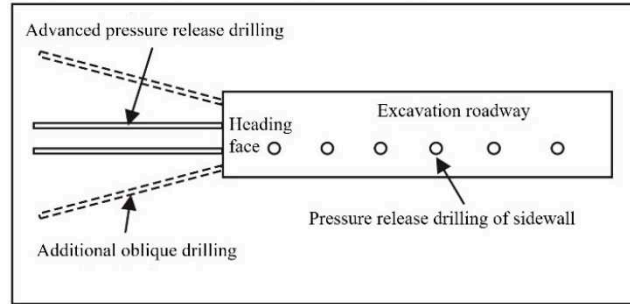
Final adjusted pressure relief plan for ultra thick coal seam in Liuhuanggou Coal Mine (Strike section of excavation road) [39].
